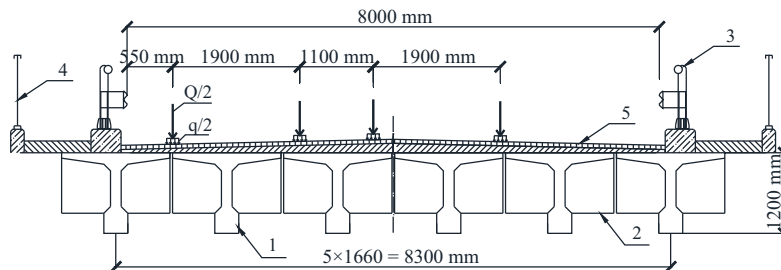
Cross section of pre-stressed RC road-bridge superstructure with beam length 22.16 m of typical drawing Issue 122-62: 1 – beam element, 2 – diaphragm, 3 – metal barriers, 4 – reinforced concrete sides
